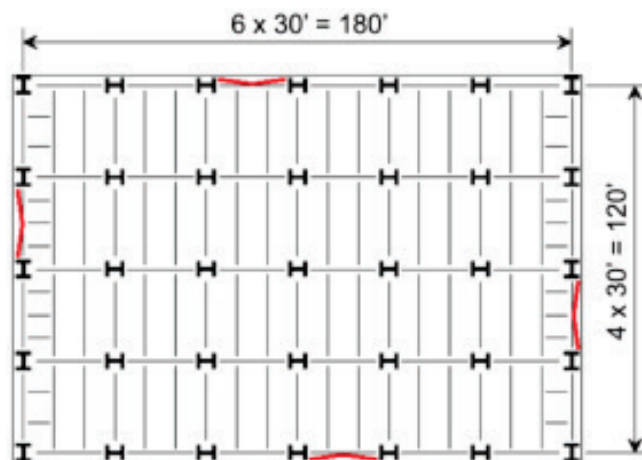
Braced-frame archetype plan from NIST GCR 10-917-8.
